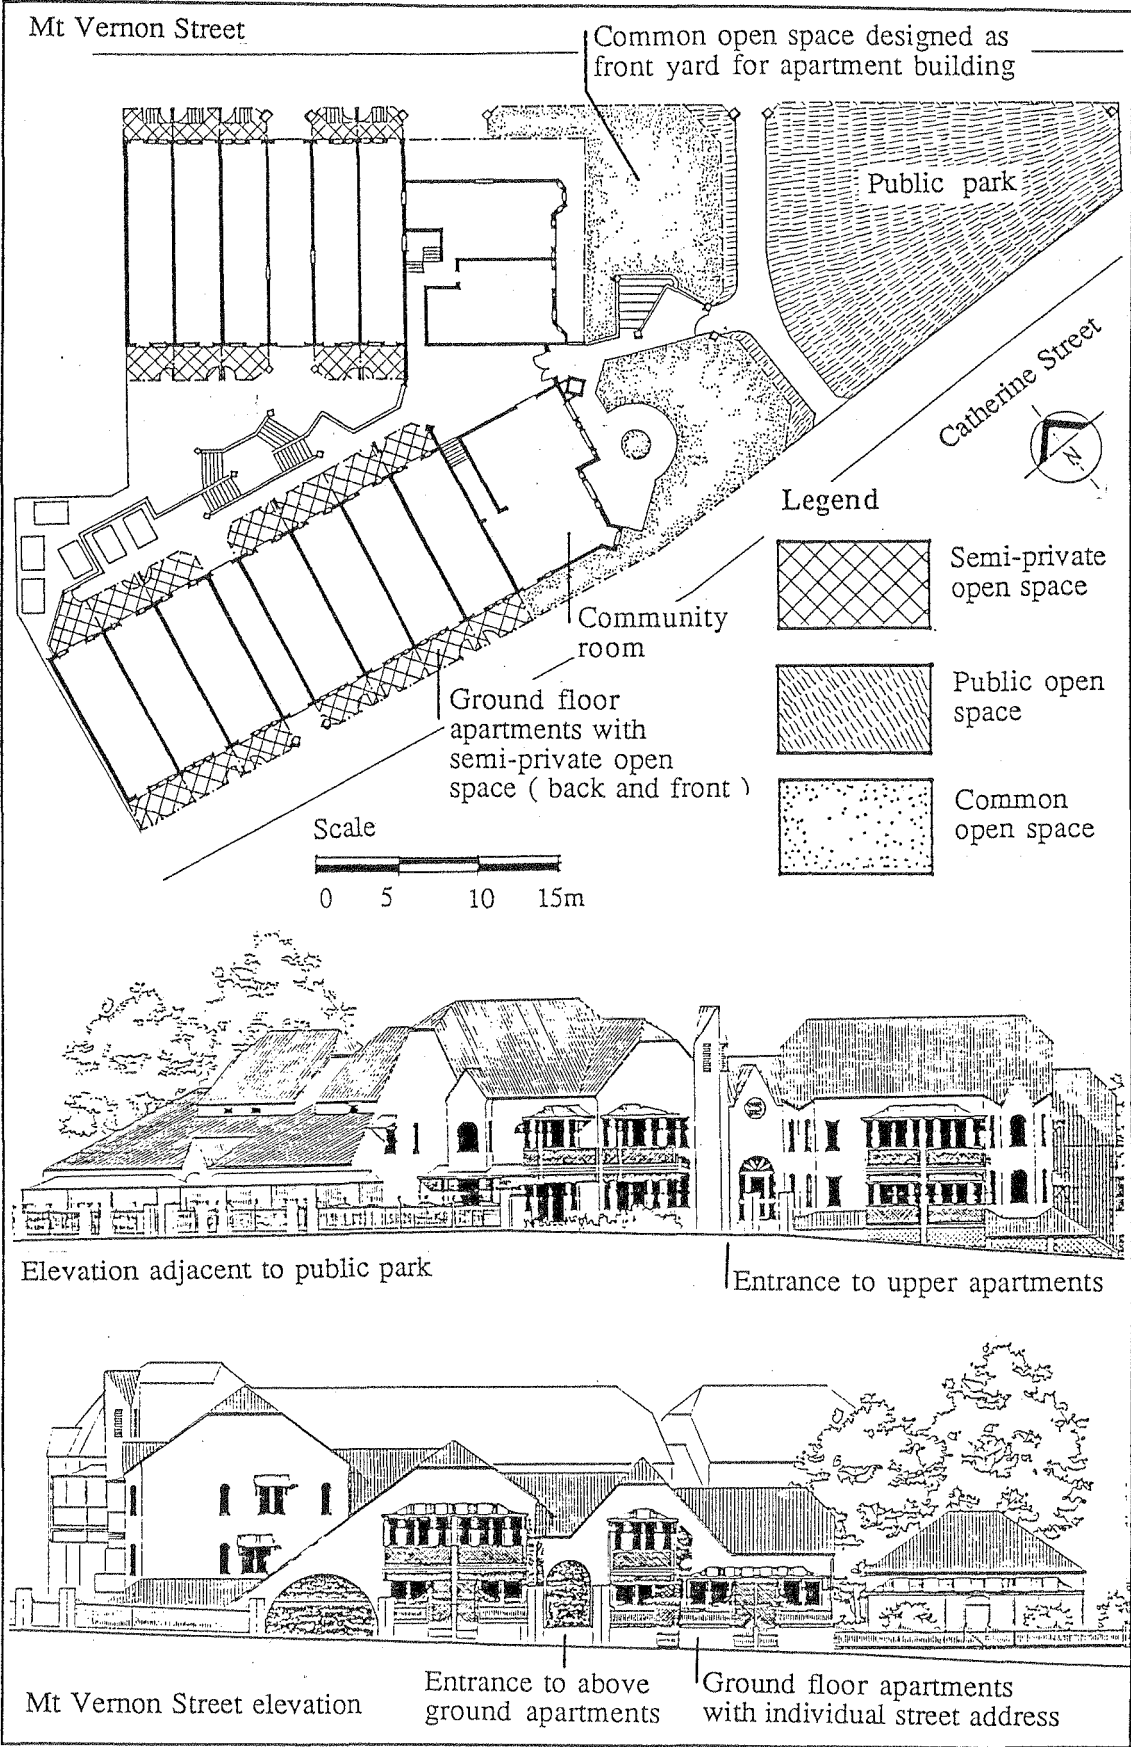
Ground floor plan and street elevations, Catherine / Mt Vernon Street
